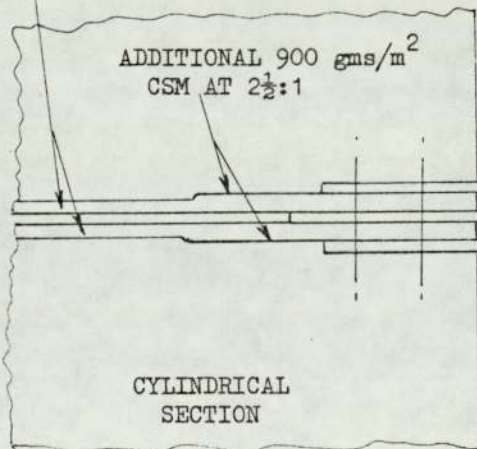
EDGE-BEAM AND CROSS-BRACING JOINT
